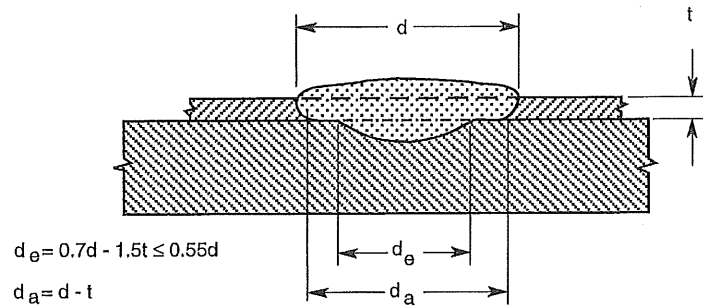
Arc Spot Weld – Single Thickness of Sheet
